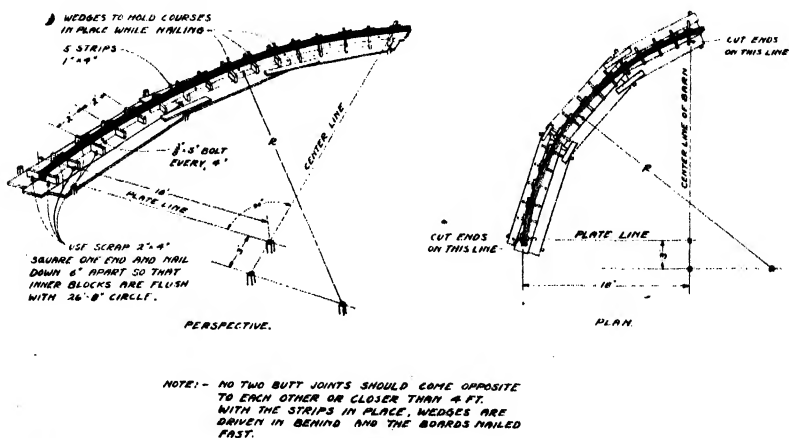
Showing a method for laying out and constructing sprung rafters. Any kind of material commonly used in roof construction may be used in their construction.
